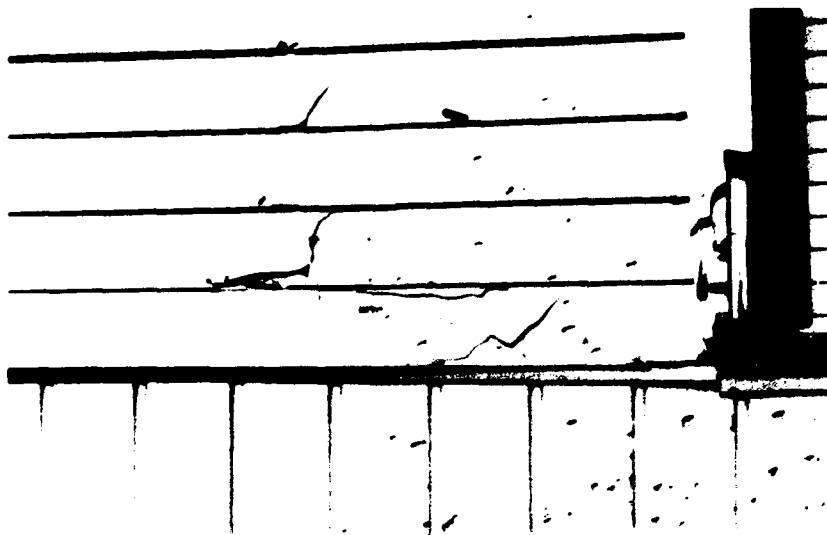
Damaged vinyl siding next to a warehouse cargo door at Fort Devens, MA. This example is not typical, but illustrates what can happen. (The small horizontal marks are mostly spattered paint.)
